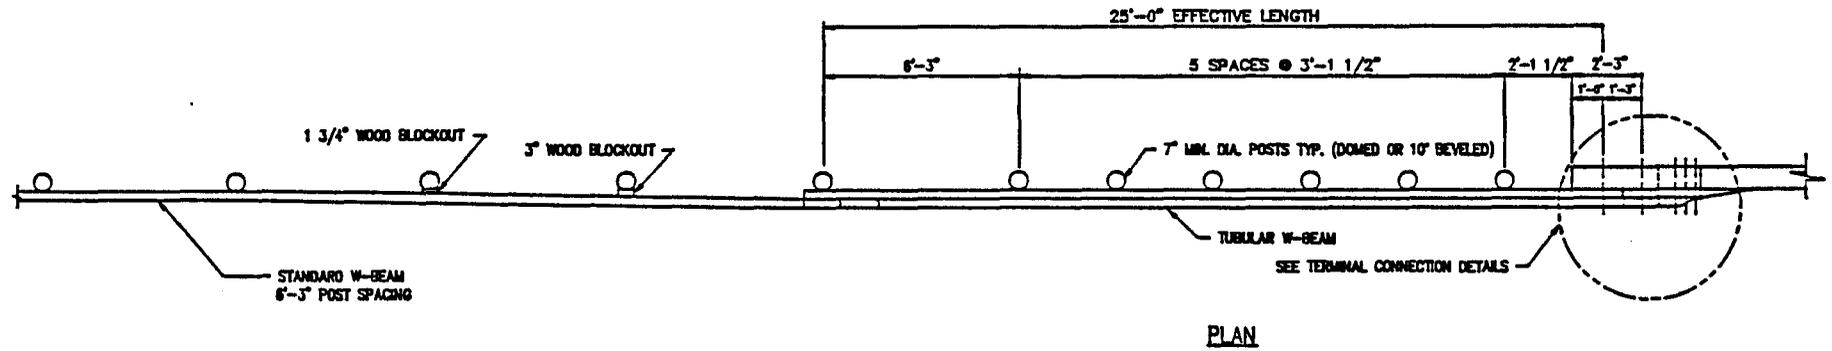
GUARDRAIL TO BRIDGE RAIL TRANSITION, RETROFIT DESIGN
